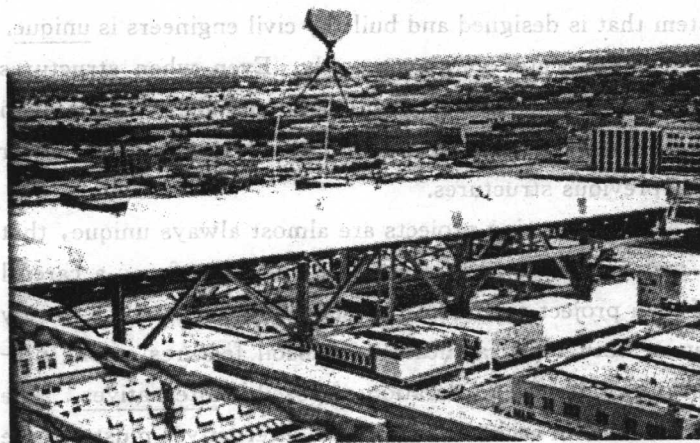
Figure II Flying formwork for a one-way concrete joint system being moved from one floor to the next in preparation for pouring. Stiff metal trusses allow a large area of formwork to be handled by a crane as a single piece.
